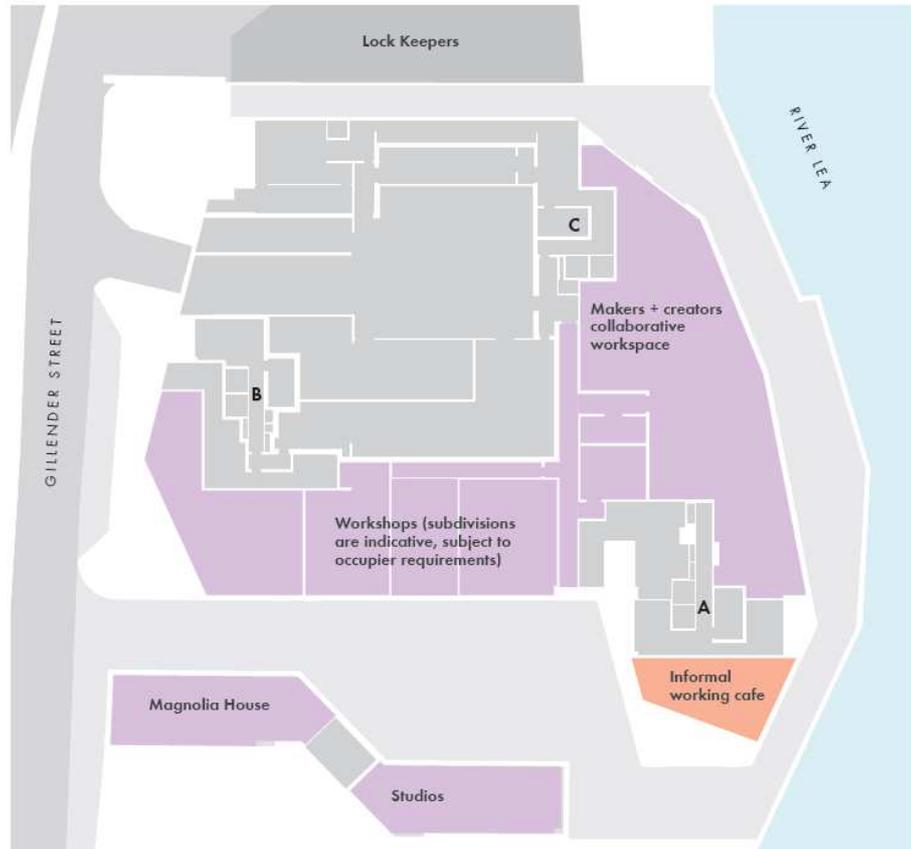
Diagram illustrating the proposed subdivision of units and commercial layout within the development.
